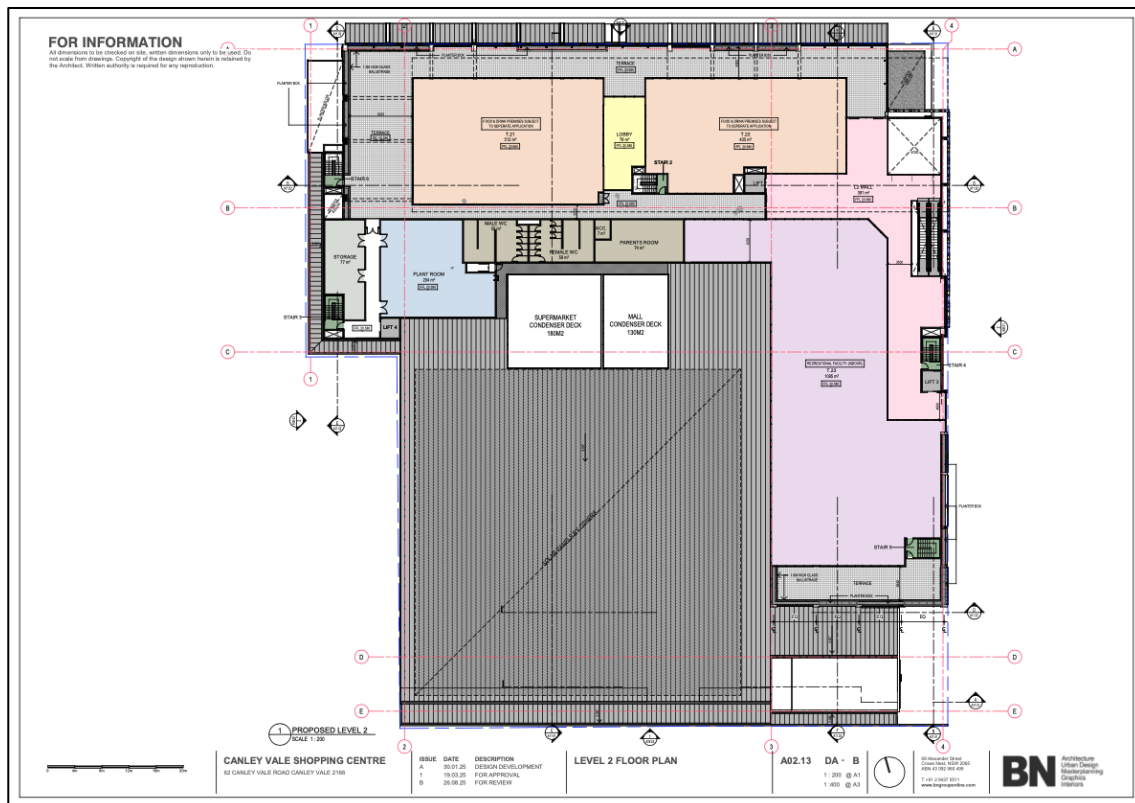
Proposed level 2 floor plan – gym and food and beverage
